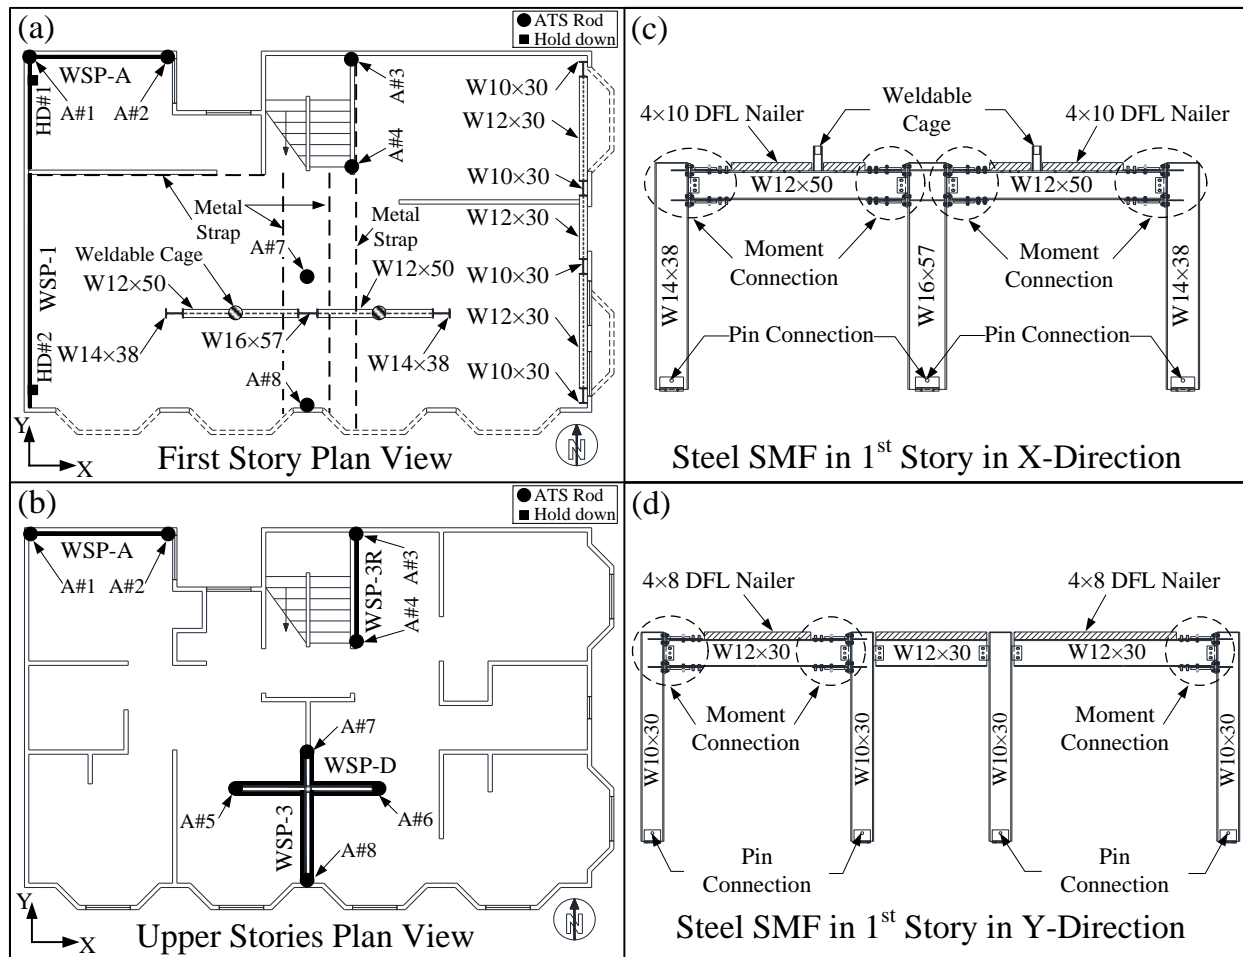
Detail of PBSR retrofit elements: (a) Plan view of first story, (b) Plan view of upper stories, (c) Steel SMF along longitudinal direction, (d) Steel SMF along transverse direction.
